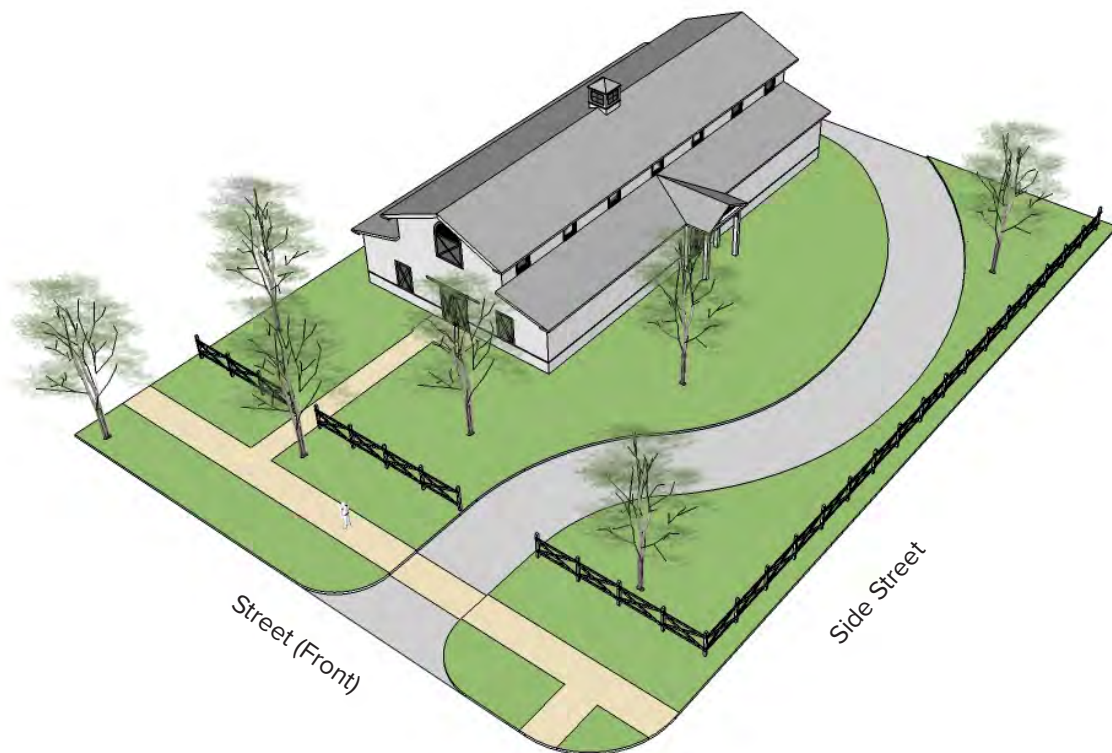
Illustrative example of buildings and site arrangement in the T2 Rural Zone.
